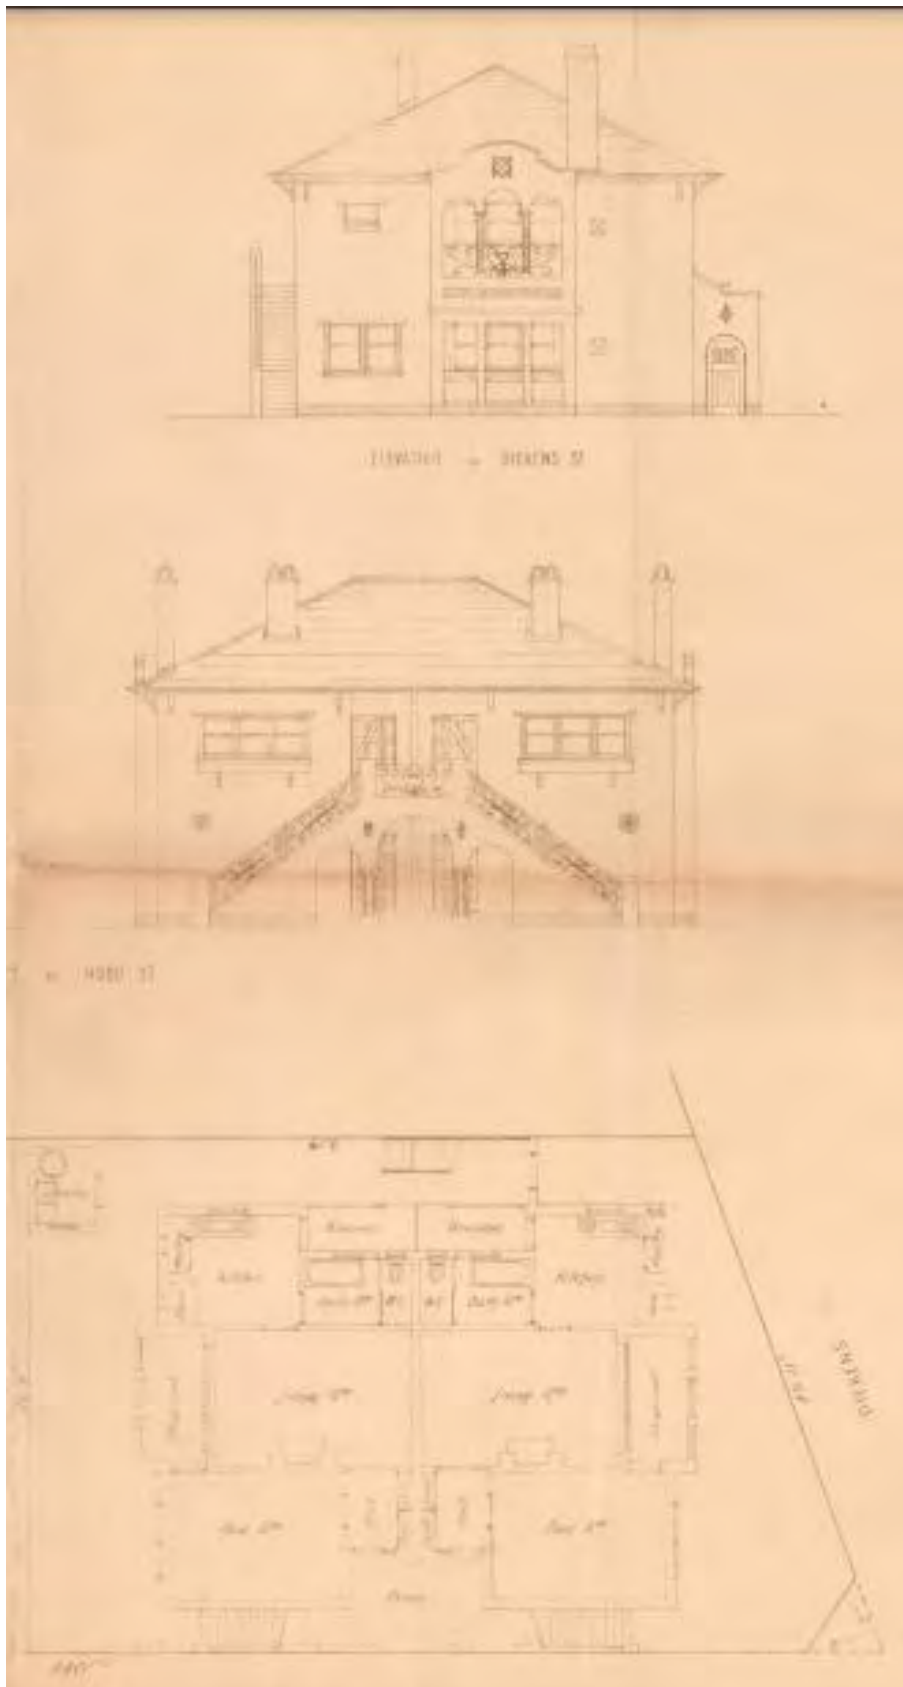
Two proposed block of flats Dickens Street and Hood Street, St Kilda. Source: J. E. Powell. n.d. Drawings of 75 Dickens Street and 9 Hood Street, Elwood. Council Records. City of Port Phillip.
